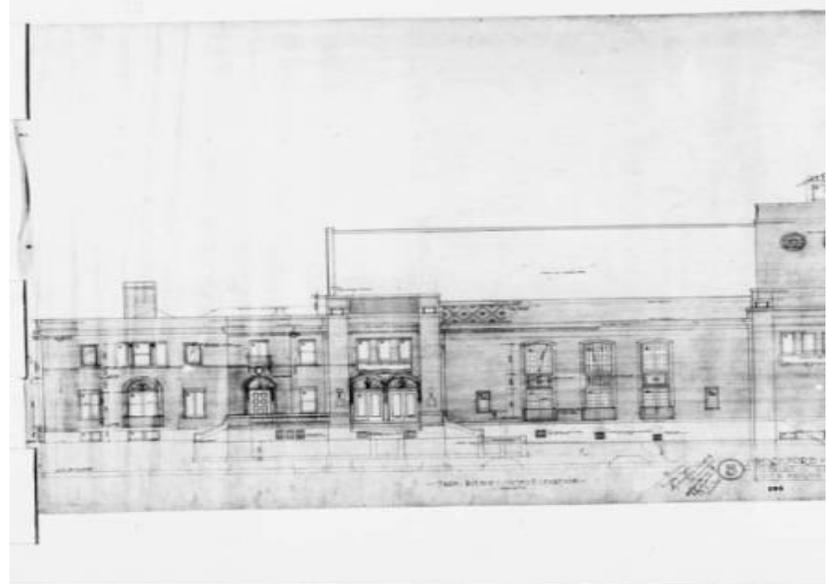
Historic Tallmadge and Watson Architectural Plan; South Elevation
